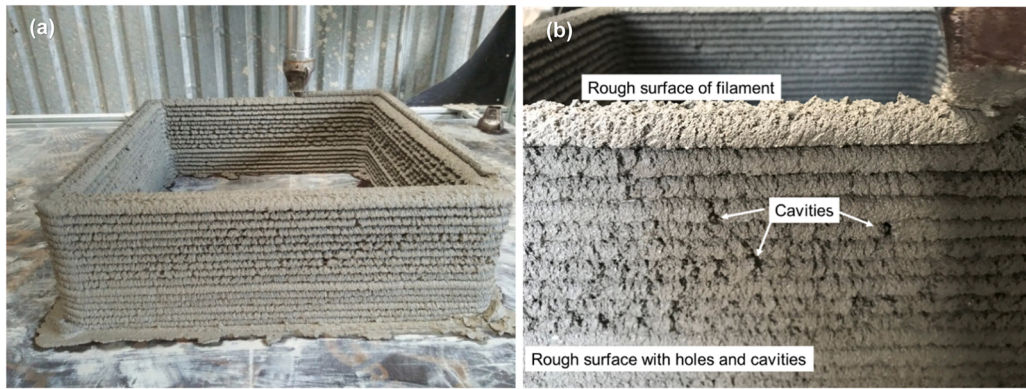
Printed structure (a) and finishing surface of printed structure (b) using G12.
